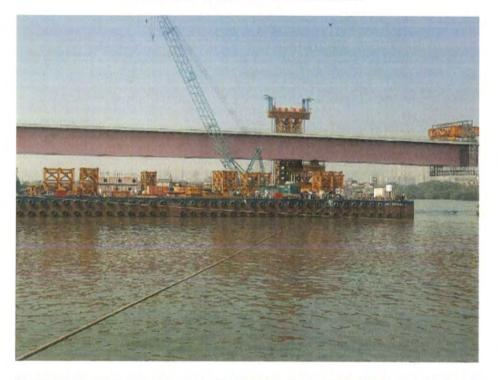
OSD 4 N span 3 Girder Transporting to MP 126 N through Barge
